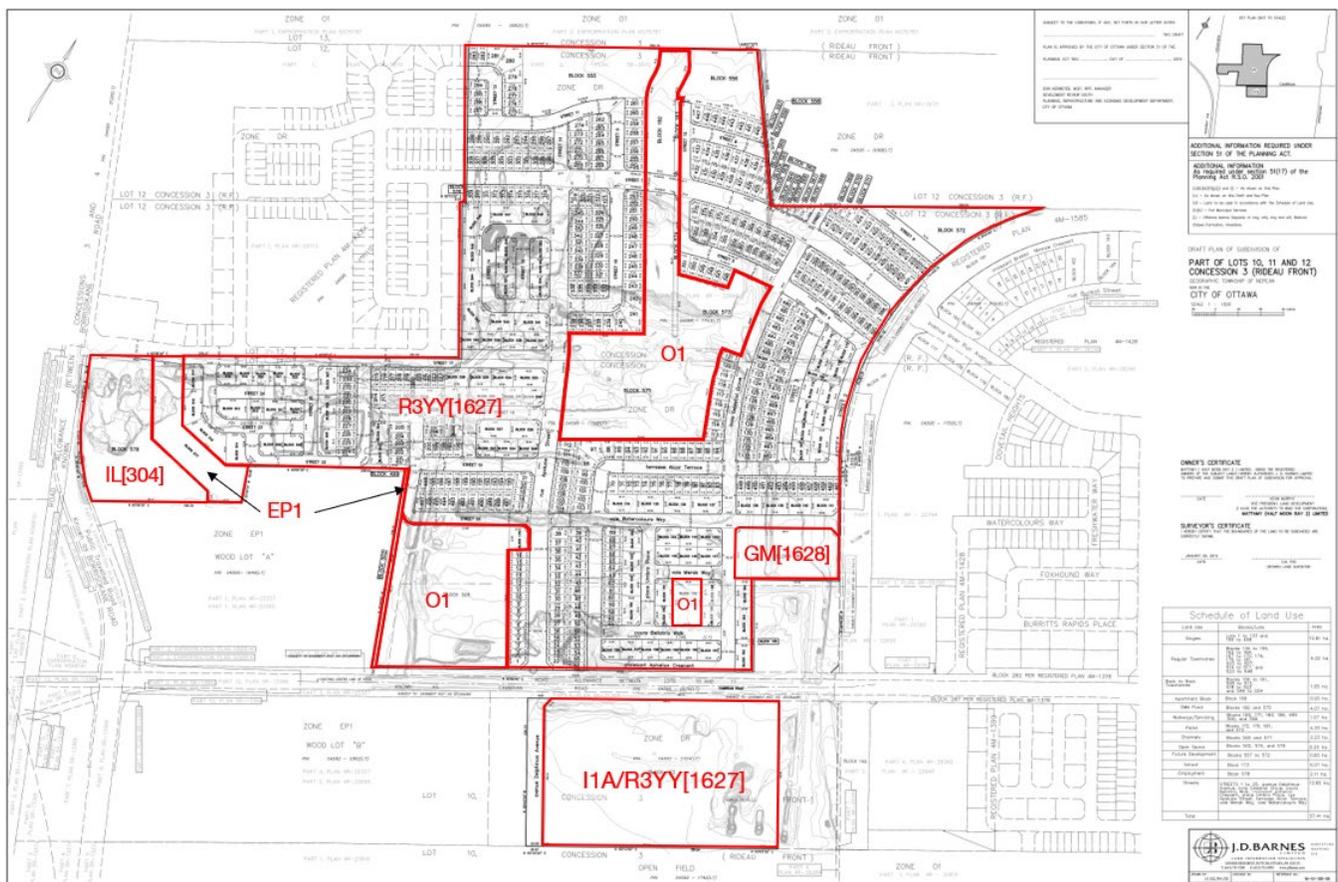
Proposed zoning for revised Draft Plan of Subdivision
